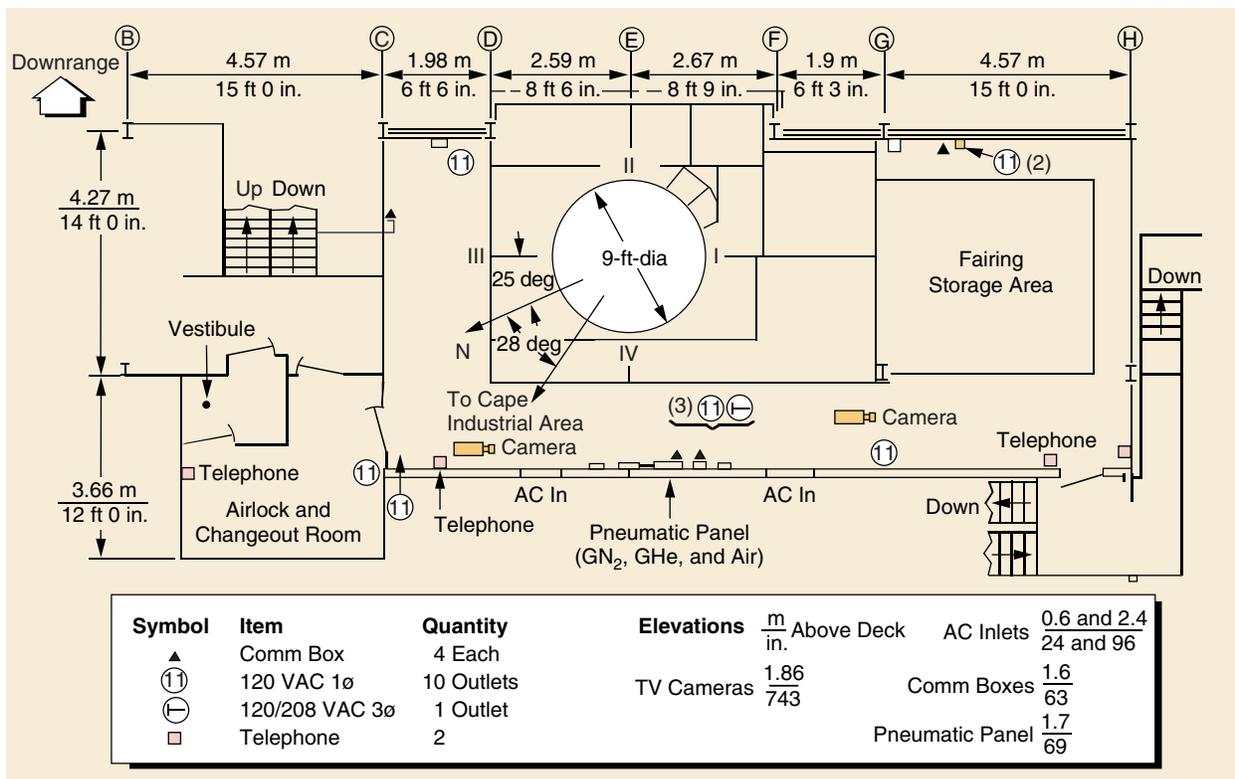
B. Level 9A Floor Plan, Pad 17B
